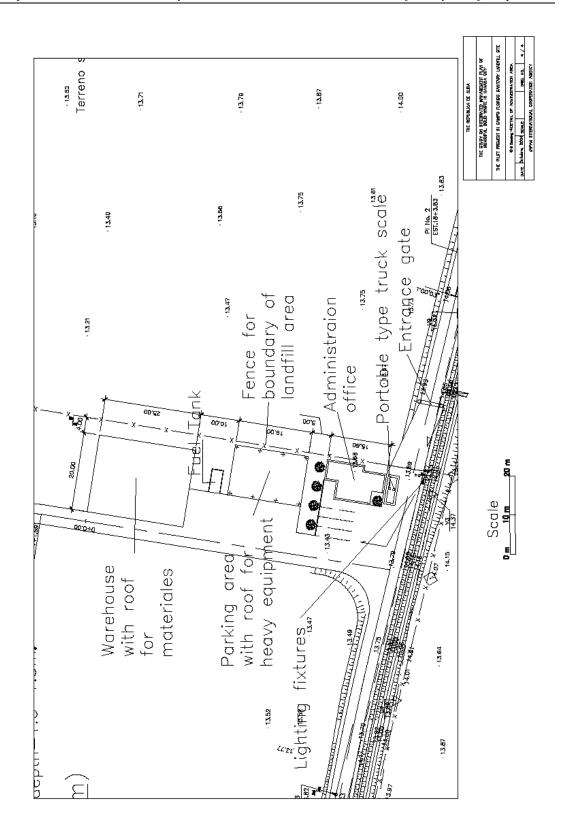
Site Plan of Administration Area in Campo Florido Landfill Site
